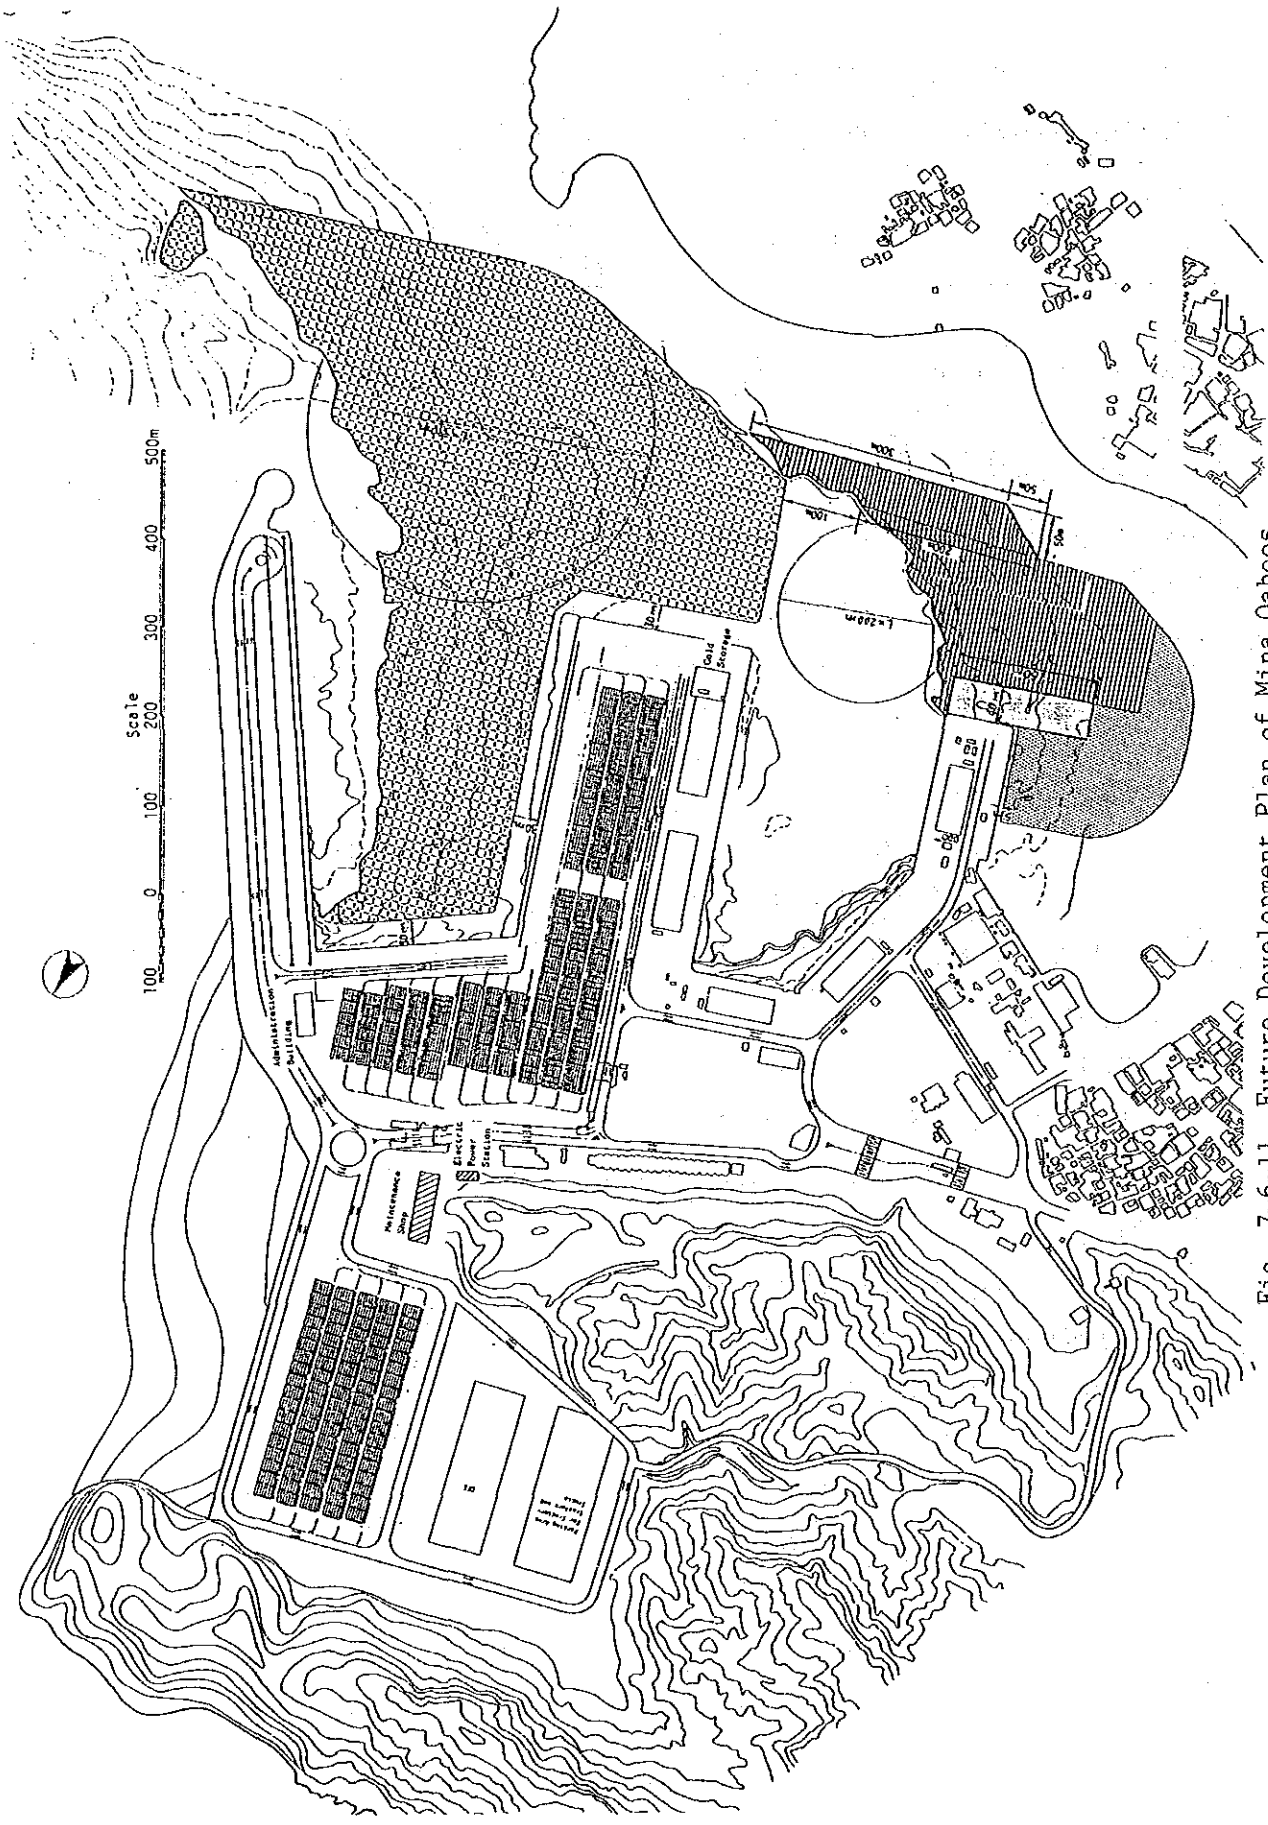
Future Development Plan of Mina Qaboos
